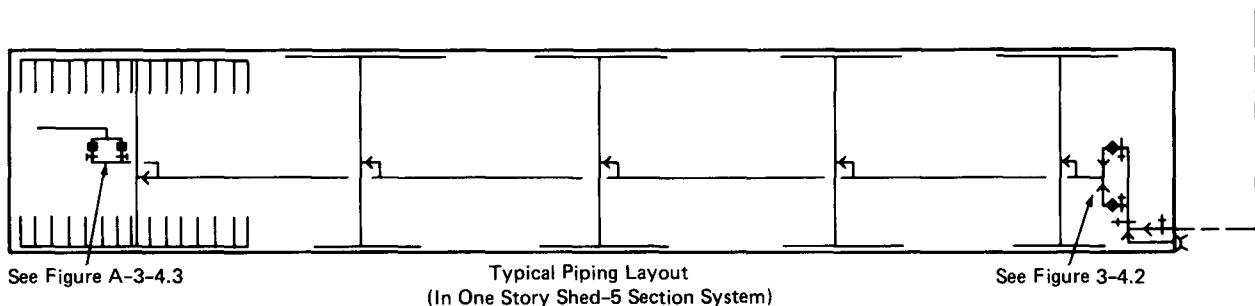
Typical piping layout for combined dry pipe and preaction sprinkler system.
